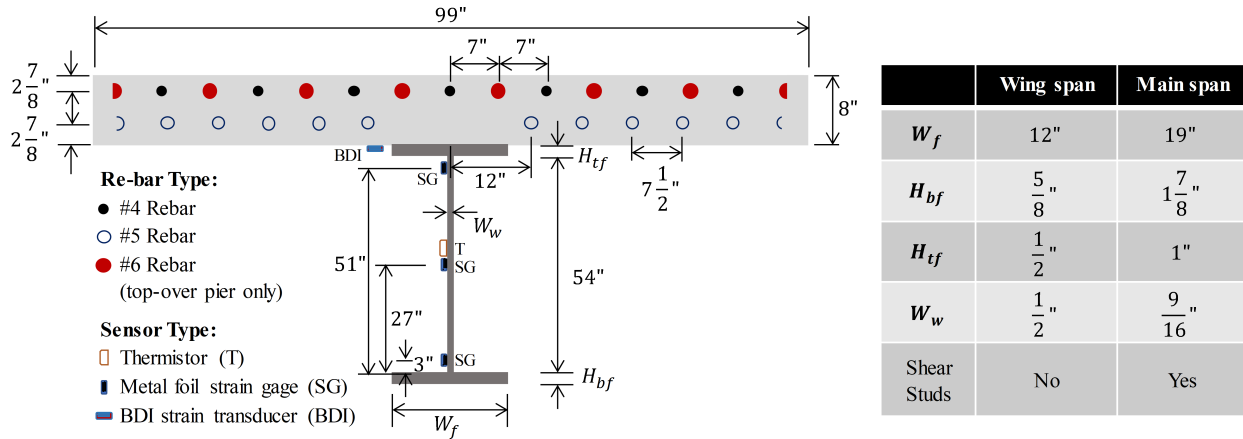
Interior cross section of Telegraph Road Bridge with key structural dimensions documented for the tail (wing) and main spans.
